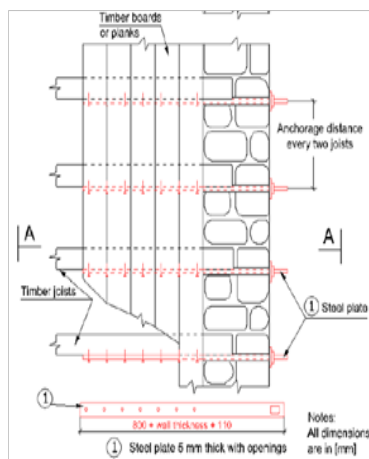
Stiffening large interfloor spaces with steel trusses and anchoring them to the walls.
